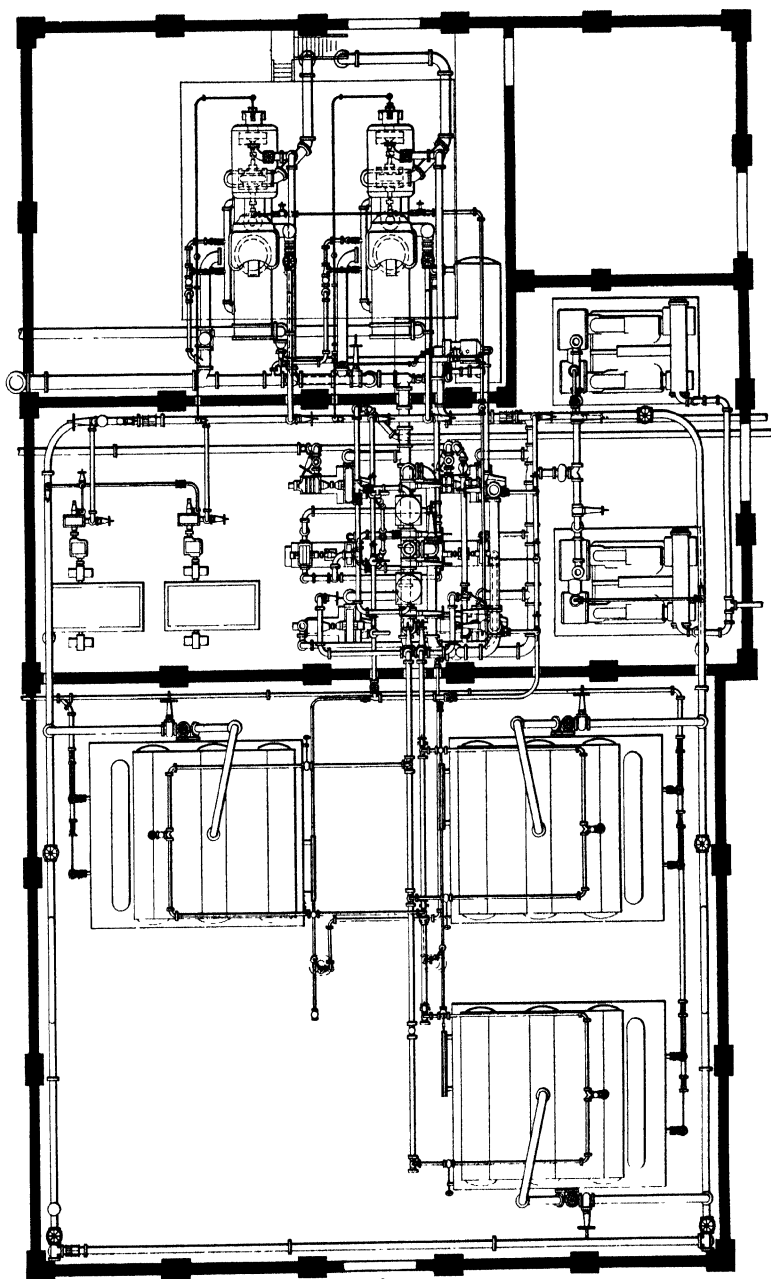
GENERAL PIPING LAYOUT LYNCH MINE POWER STATION.
